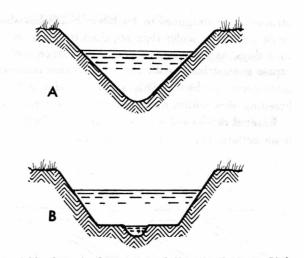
Steps in Construction of Mosquito Drainage Ditch
